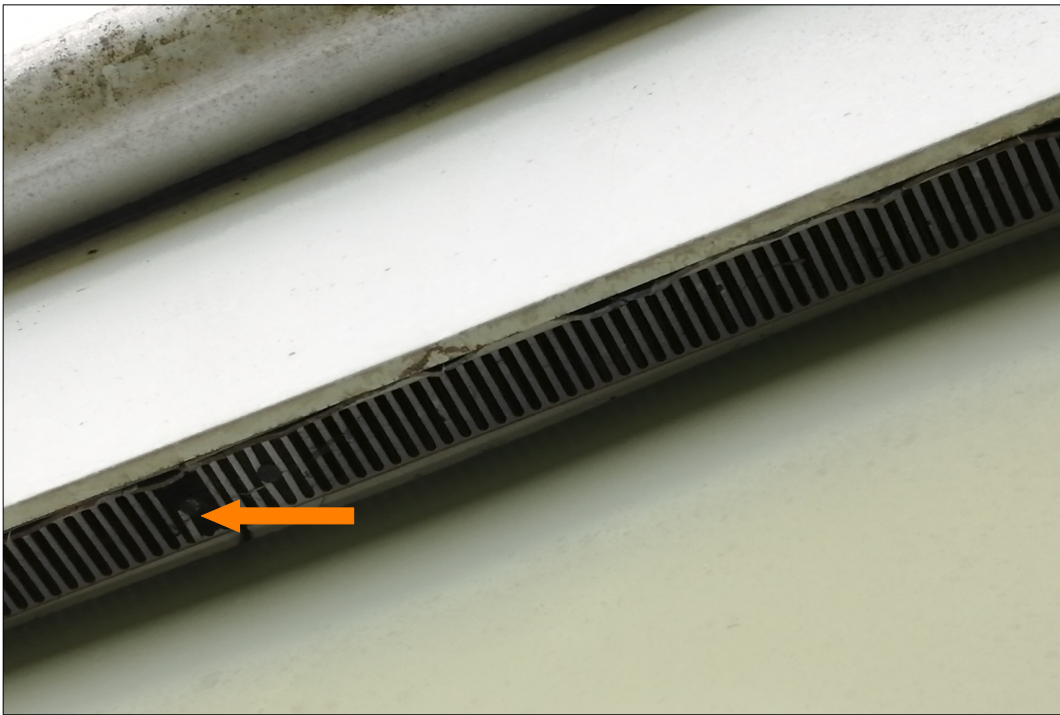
Buildings D1 & D2 – Potential bat access points under fascia boards
